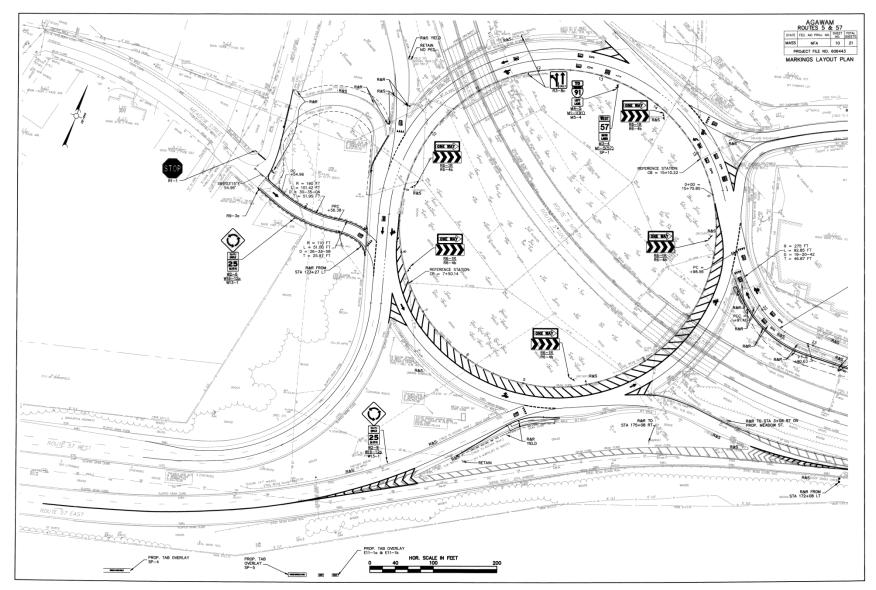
Route 5 and 57 Markings Layout Plan, Agawam.
